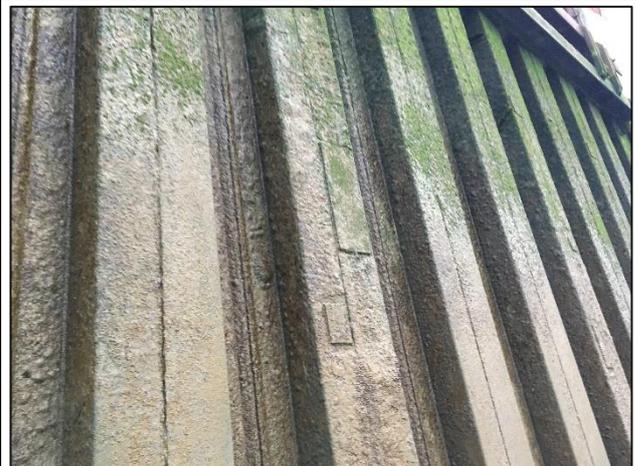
Patch repairs to steel sheet pile at mid and lower level remain securely fixed
